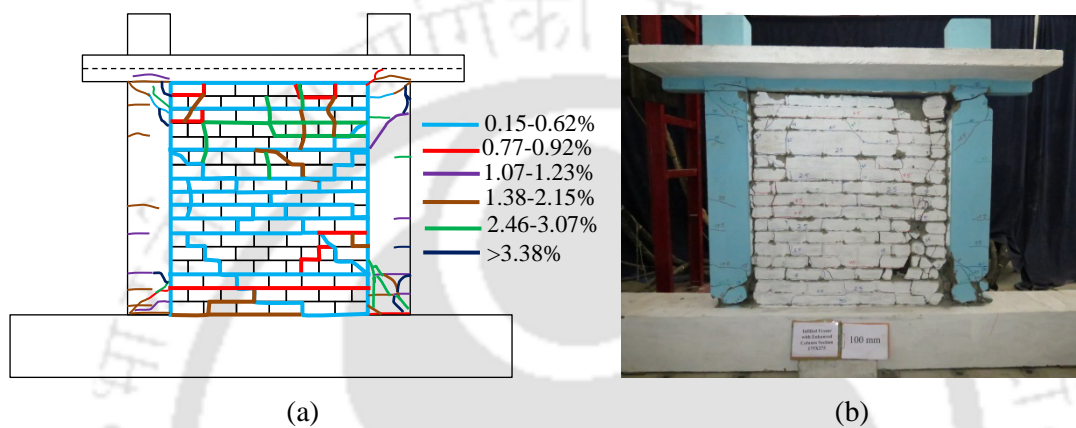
IF-EC: (a) crack pattern; and (b) failure mechanism.
